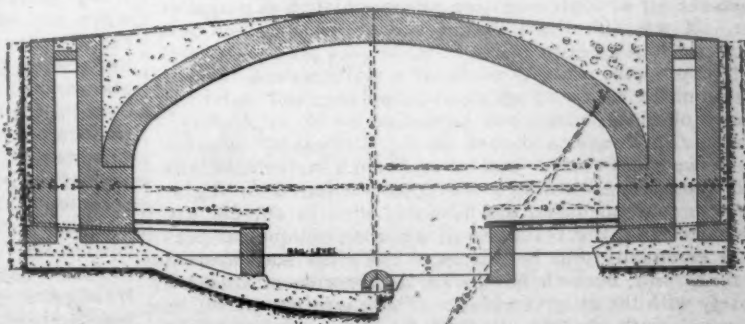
TRANSVERSE SECTION OF COVERED WAY No. 6, BRIDGTON SECTION.
